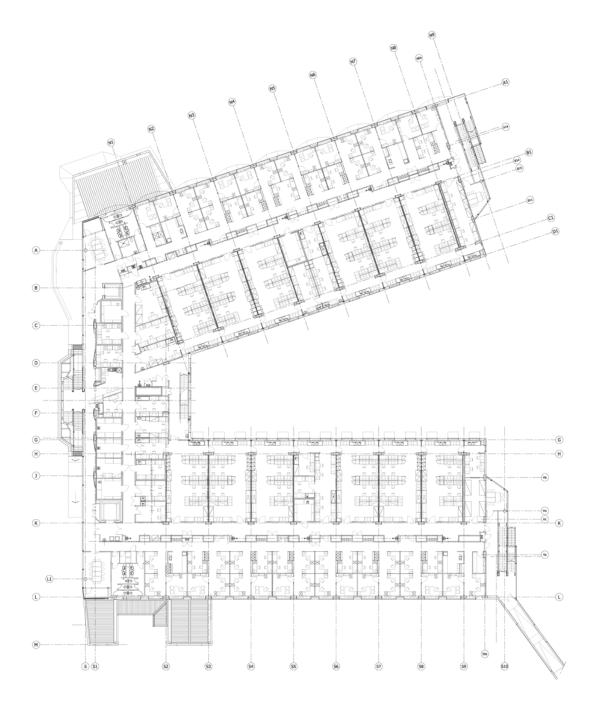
The first floor plan (ArchDaily 2012)
